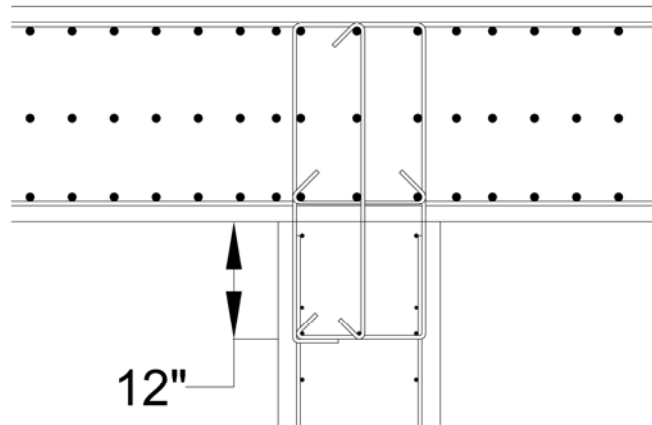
Typical Boundary Element Reinforcement at Web-Flange Connection
